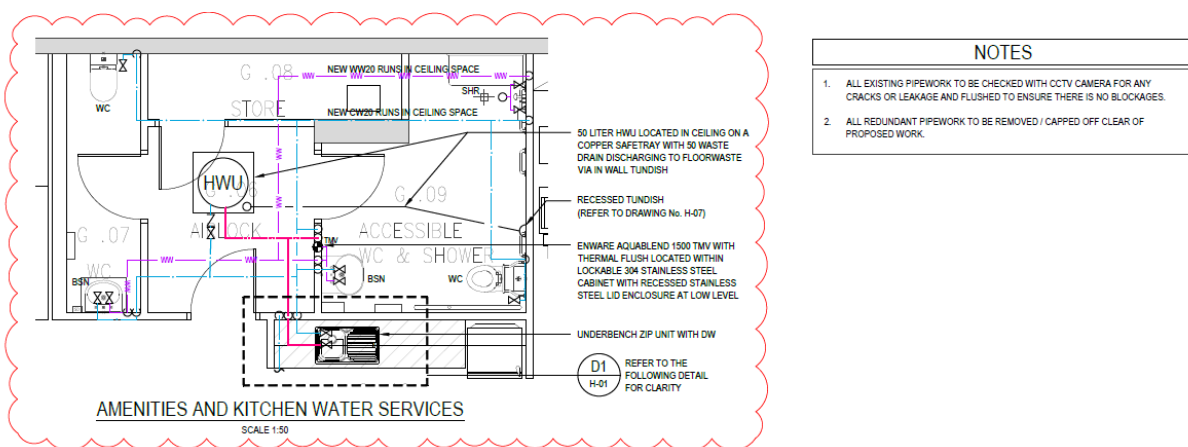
Hydraulic Services Plan (Source: VOS Group 2023)
